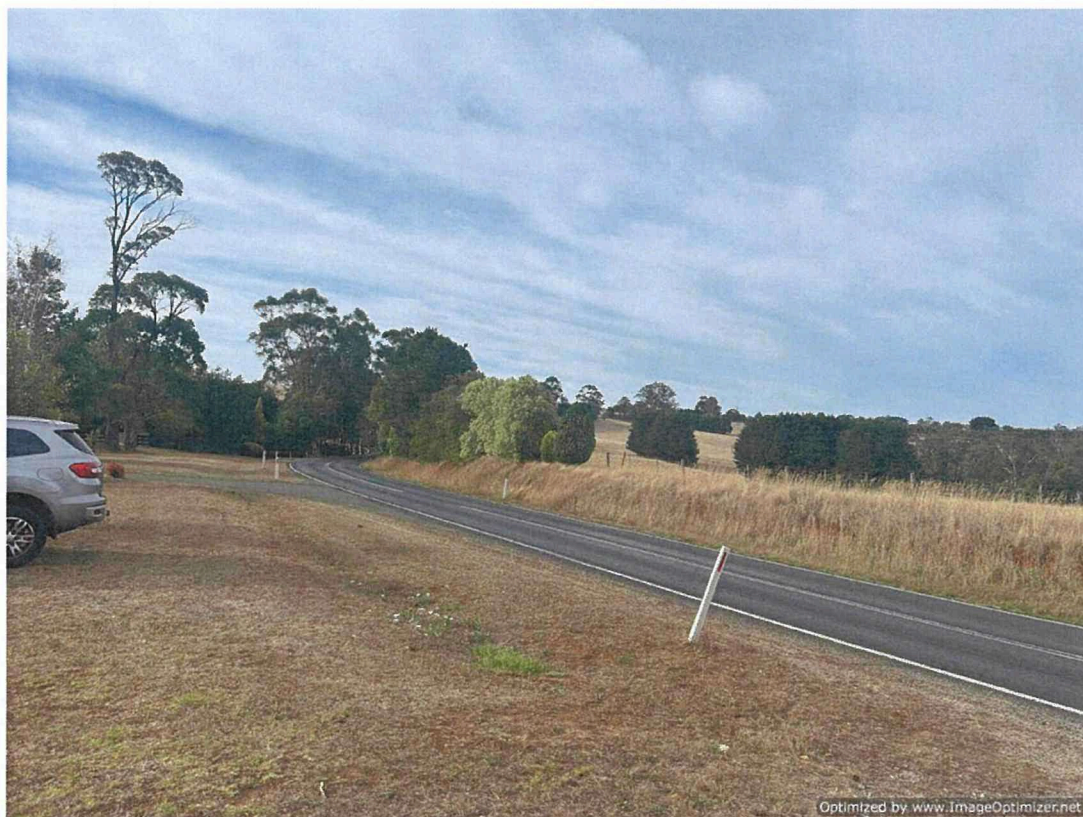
Looking west across along Korumburra – Warragul Road from the site access.
